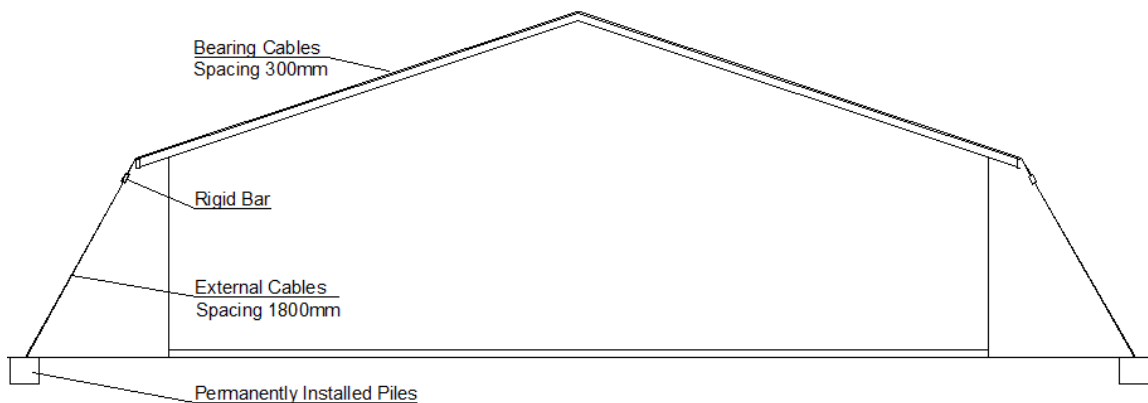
Elevation view of proposed retrofit system as applied to a gable-style roof
